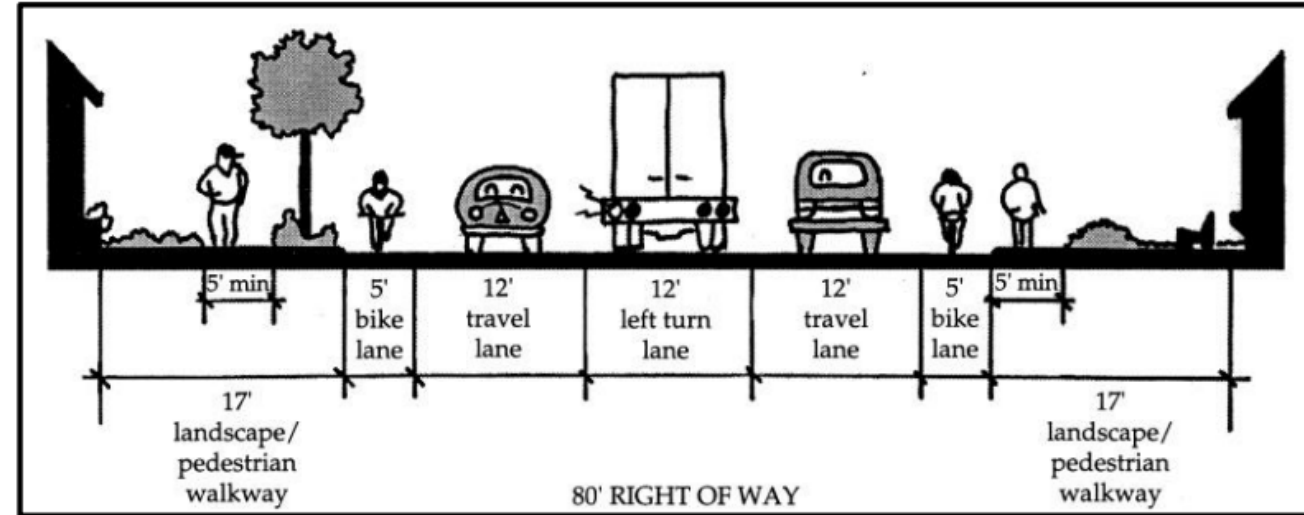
2002 Gualala Town Plan State Route 1 streetscape cross section.
